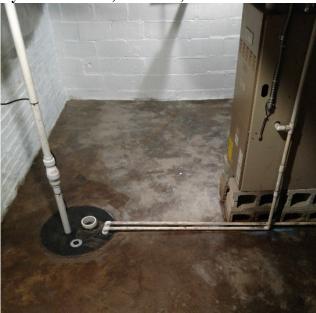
Sump pump was replaced, pit was sealed with silicone and a new lid was mechanically fastened.
